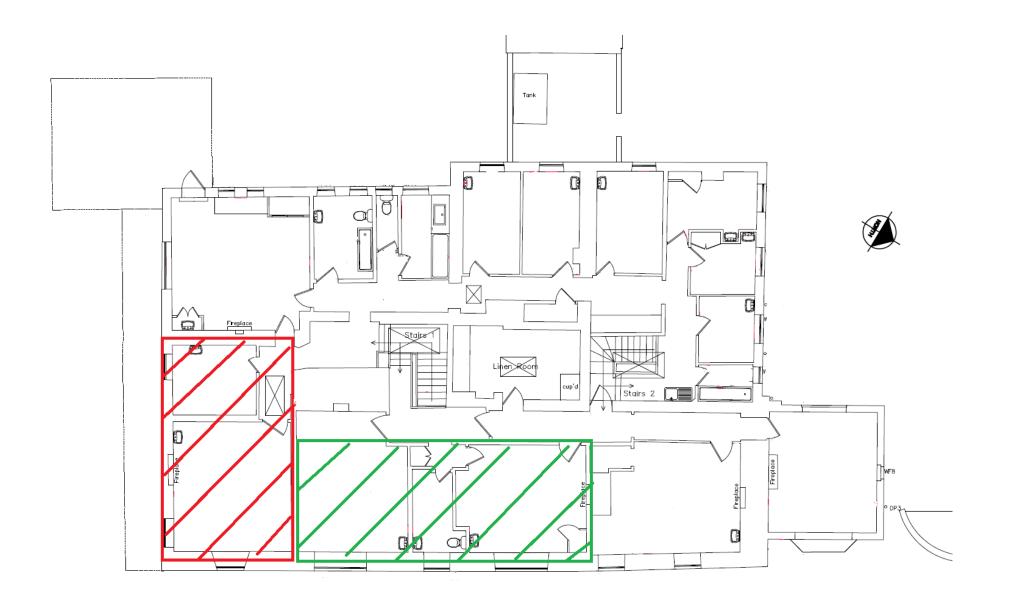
First-floor plan, showing the main range roof (green) and cross-wing roof (red), (plan supplied by The Whitworth Co-Partnership)
